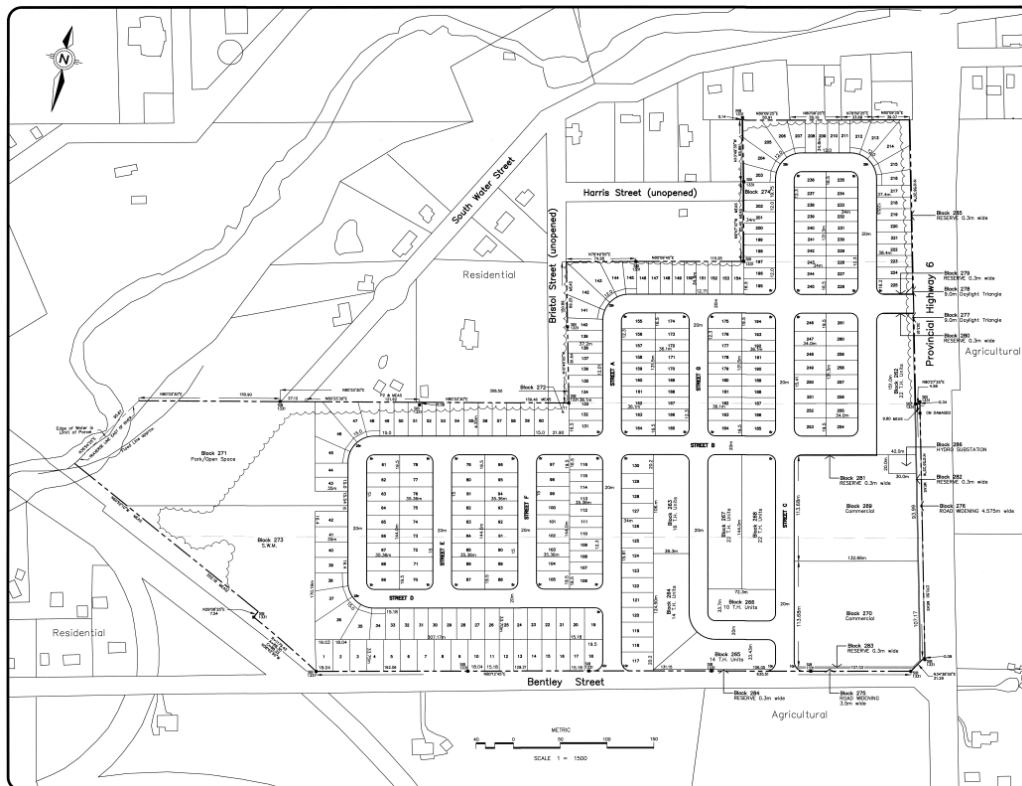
Draft Plan of Subdivision 23T-13002, submitted by J.L. Cox Planning Consulting Inc.
